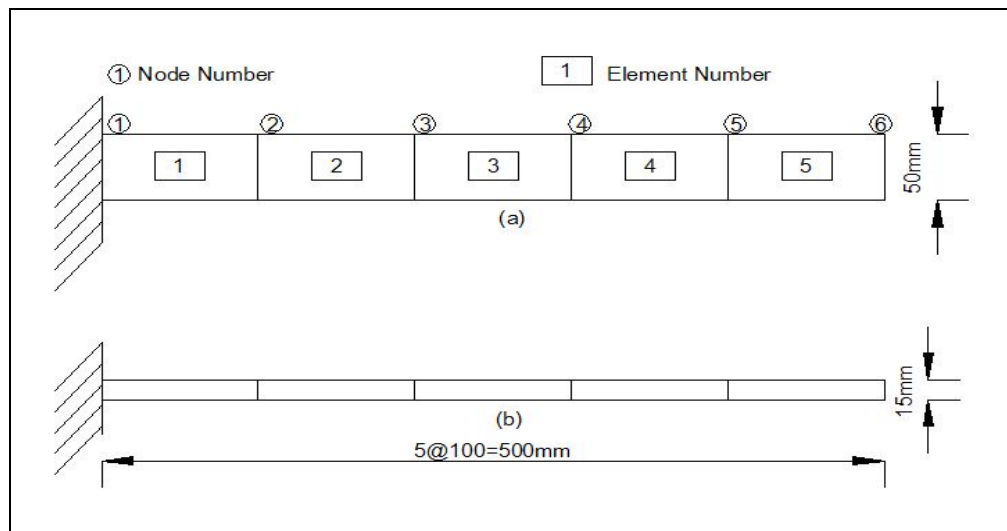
(a) Plan; and (b) Elevation of the undamaged steel cantilever beam
